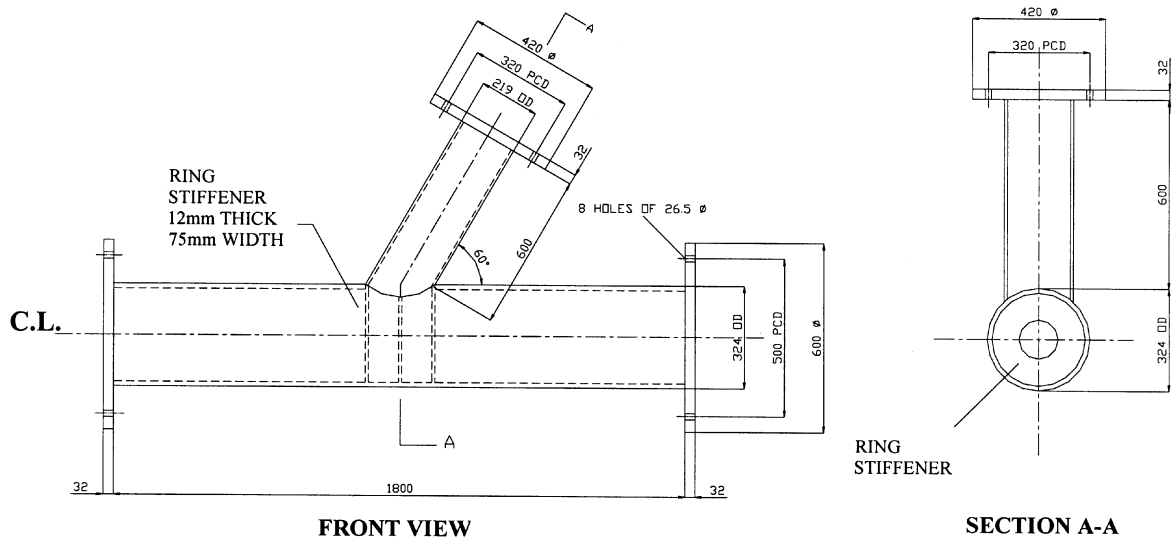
Dimensions of typical internally ring-stiffened Y-joint
